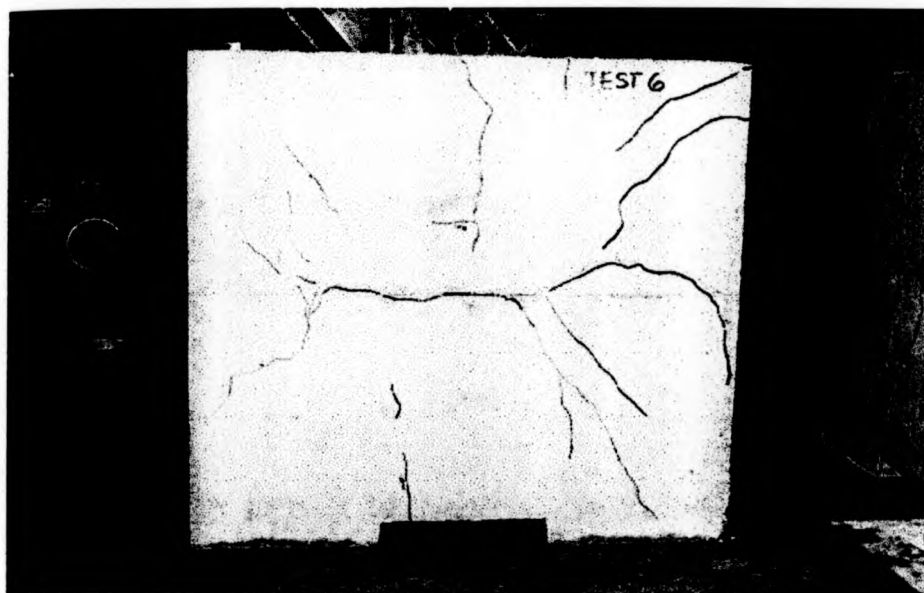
Concrete cracks pattern of PT6
